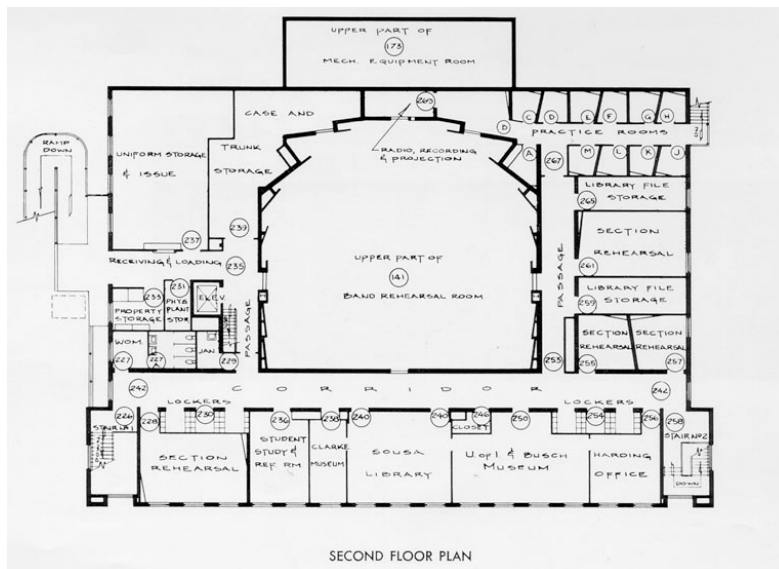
Harding Band Building, Second Floor Schematic (Gregory, 1982, p. 232, Fig. 16)
